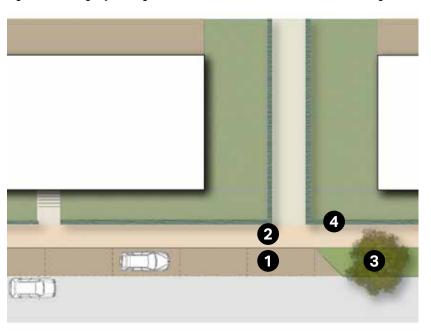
Illustrative diagram showing an indicative layout of on-street inset parking.
